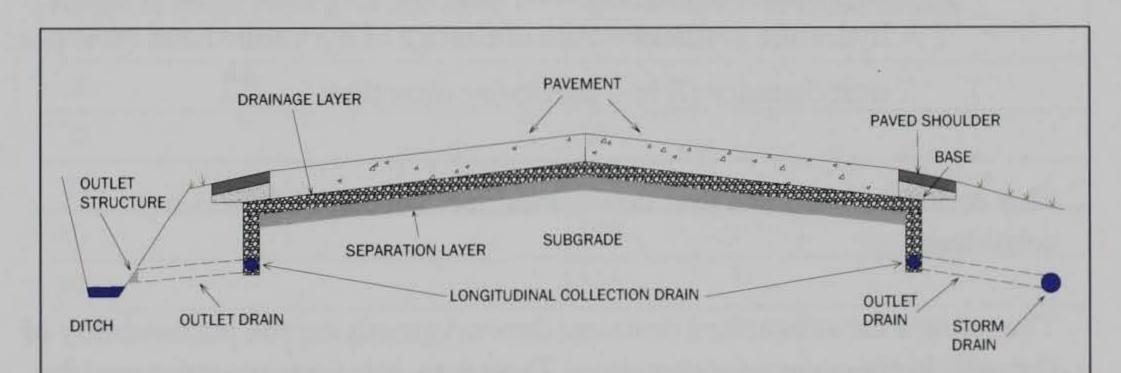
Collector drain used to remove infiltration water from the pavement system.
